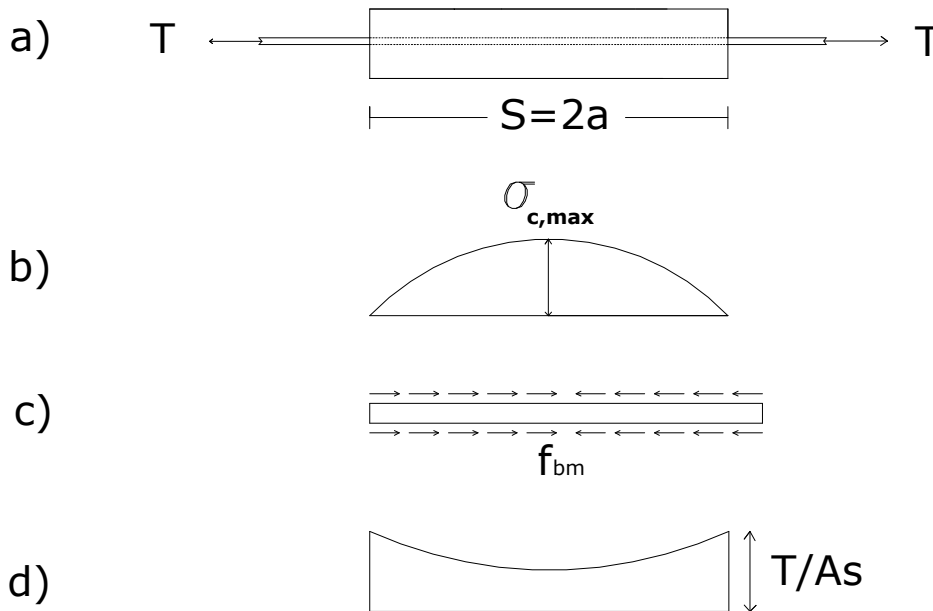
Distribution of concrete, steel bar and bond stress at a crack spacing.
